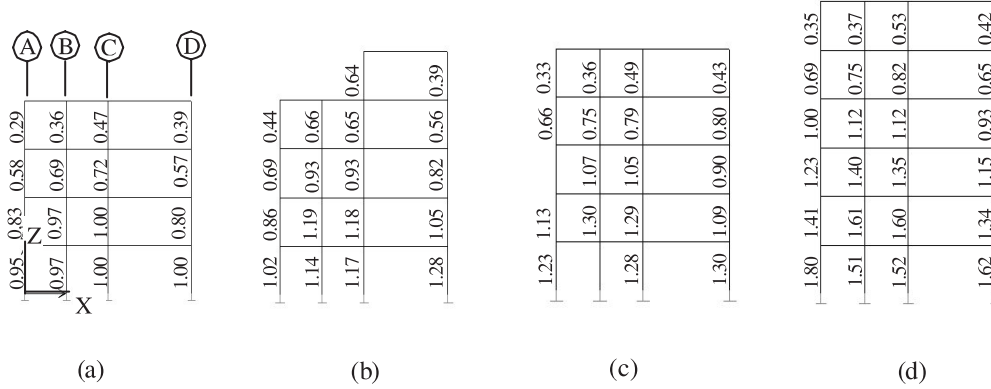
The column capacity ratios for axis 2-2 of F buildings: (a) 4-storey, (b) 4-storey with terrace floor, (c) 5-storey, (d) 6-storey building.
